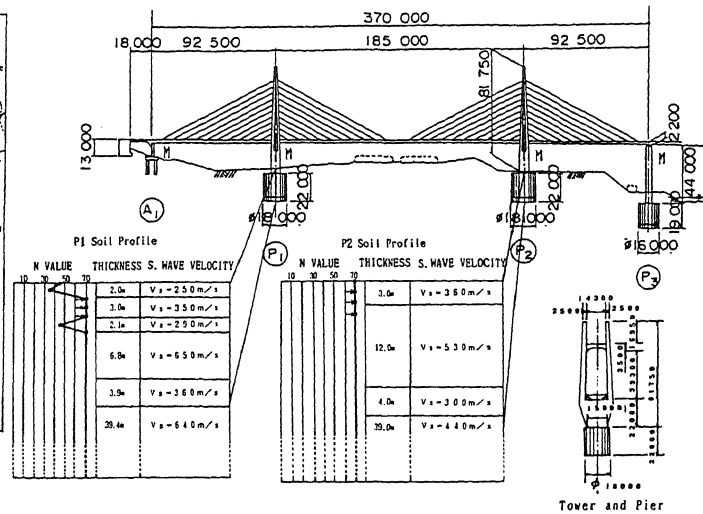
The Tomei Ashigara Bridge (Cable stayed bridge)
